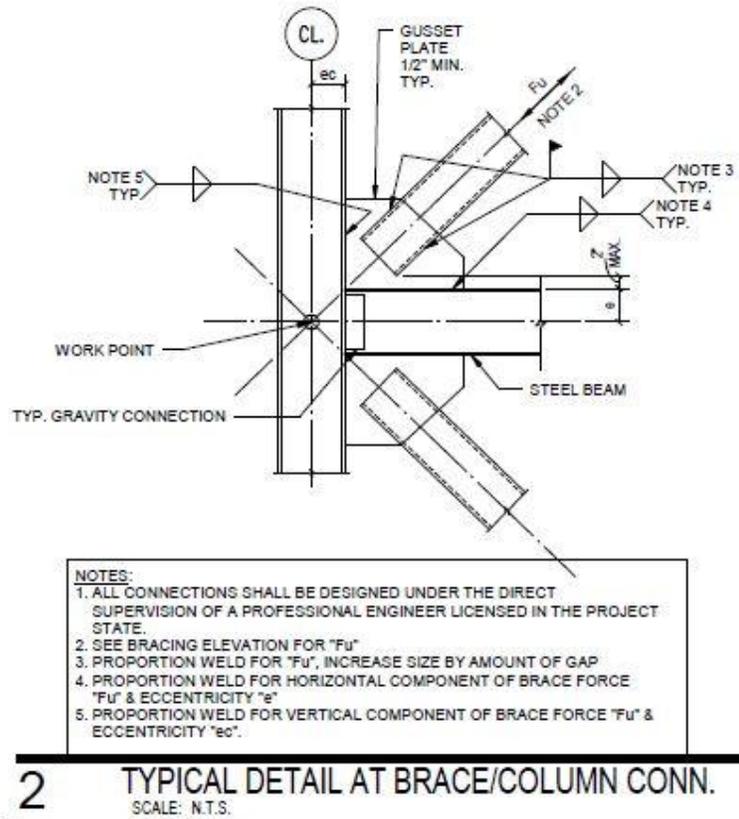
As Built Braced Frame Beam-Column Connection (Construction Documents)
